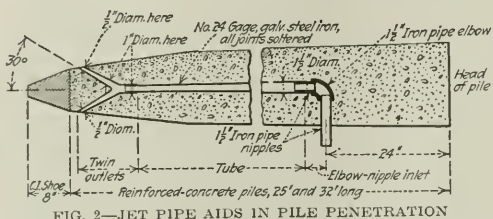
JET PIPE AIDS IN PILE PENETRATION
